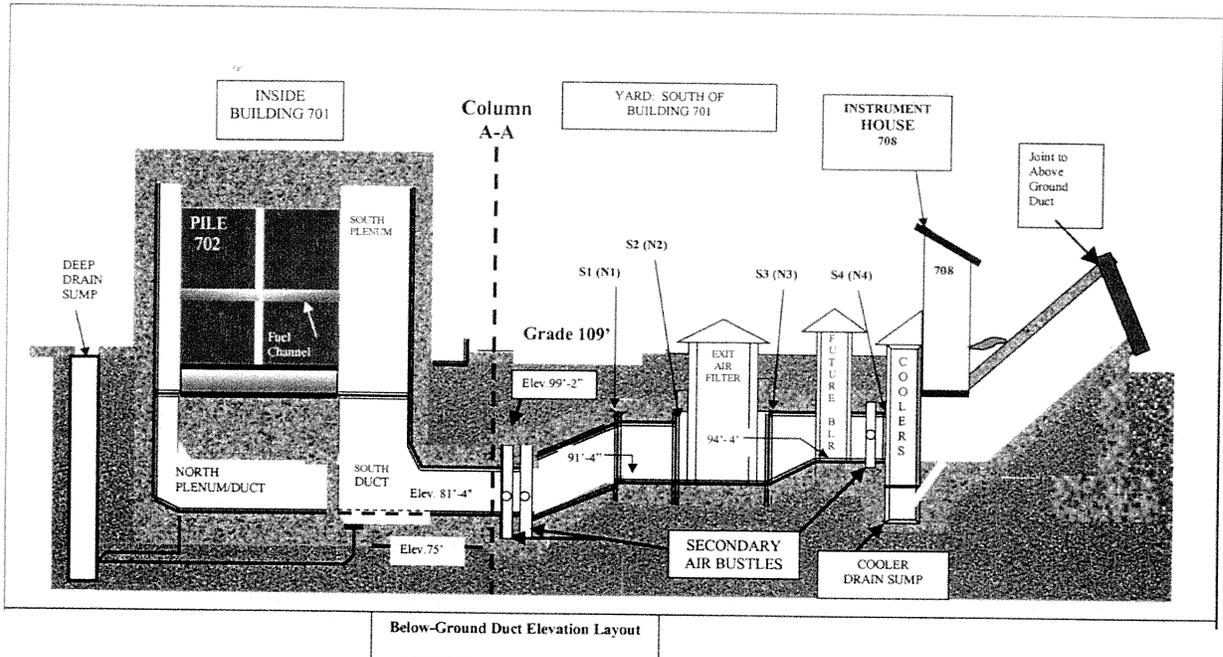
General Arrangement of Below Ground Duct Components & Structures
